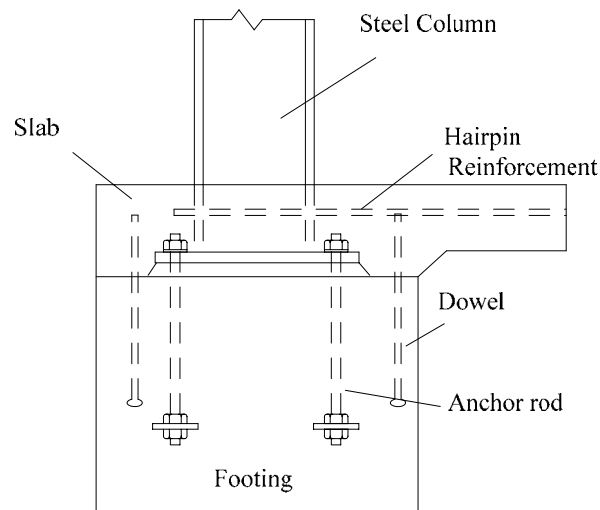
Steel column shallowly embedded in a reinforced slab
